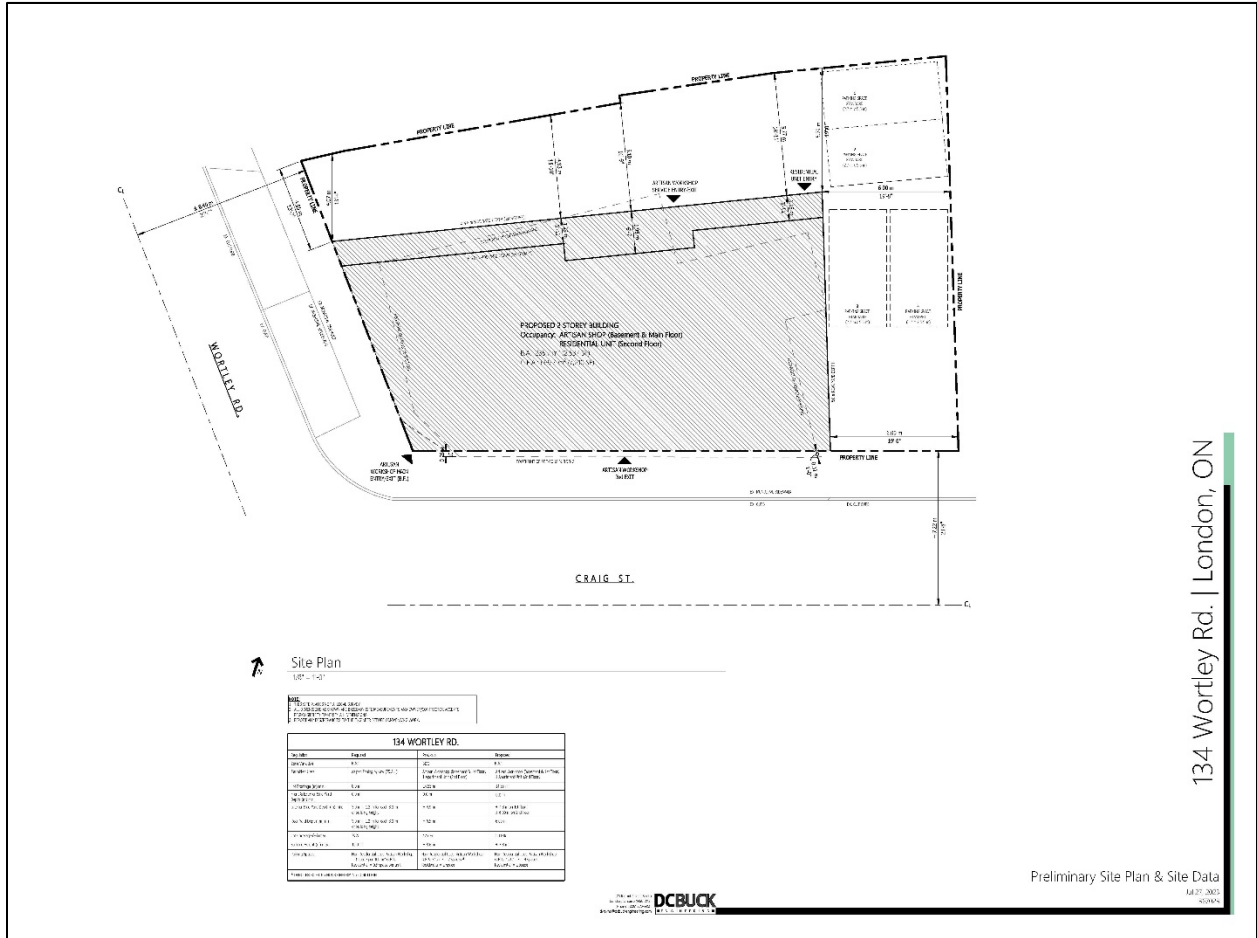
Preliminary Site Plan and Site Data, final Heritage Set (July 27, 2023).
